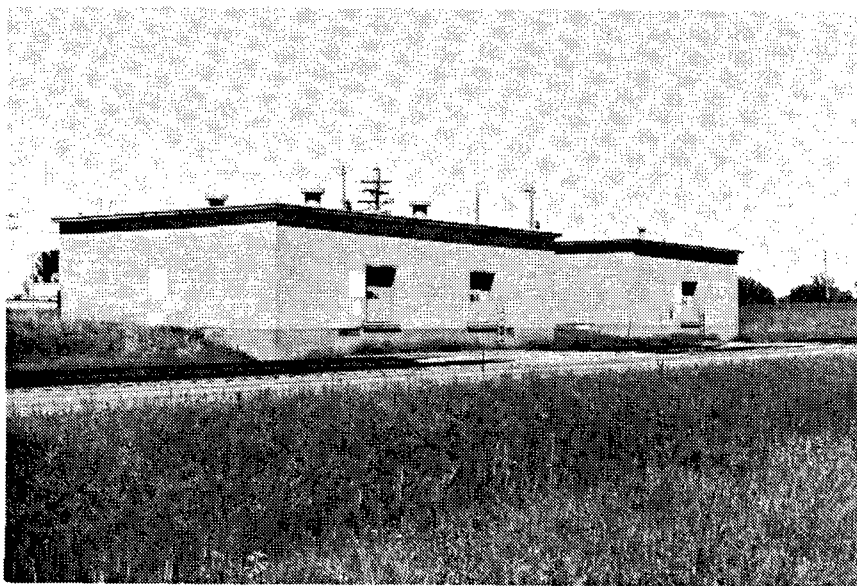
Buildings 126 (right) and 127 (left): Facades on the rail loading doors of these Small Arms Pyro Magazines.
